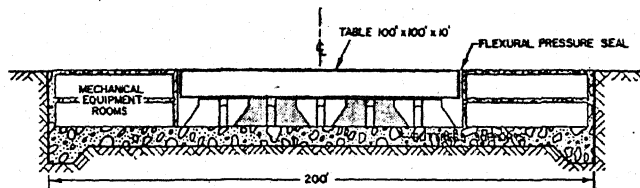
(a) VERTICAL CROSS-SECTIONAL VIEW OF LARGE SIZE TABLE AND FOUNDATION
